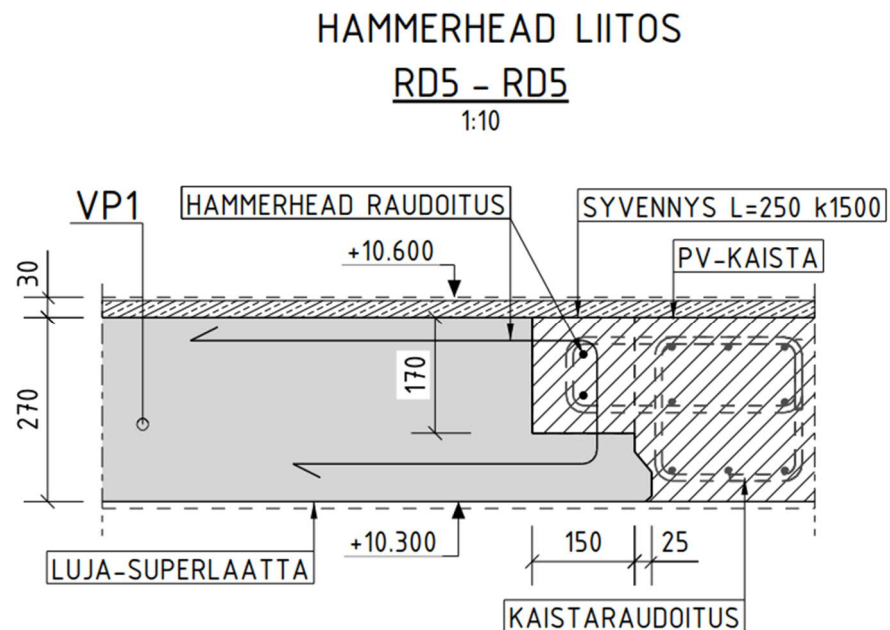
Hammerhead connection: Luja-Superlaatta to the cast-in-situ slab (Tekla Structures drawing snapshot)
